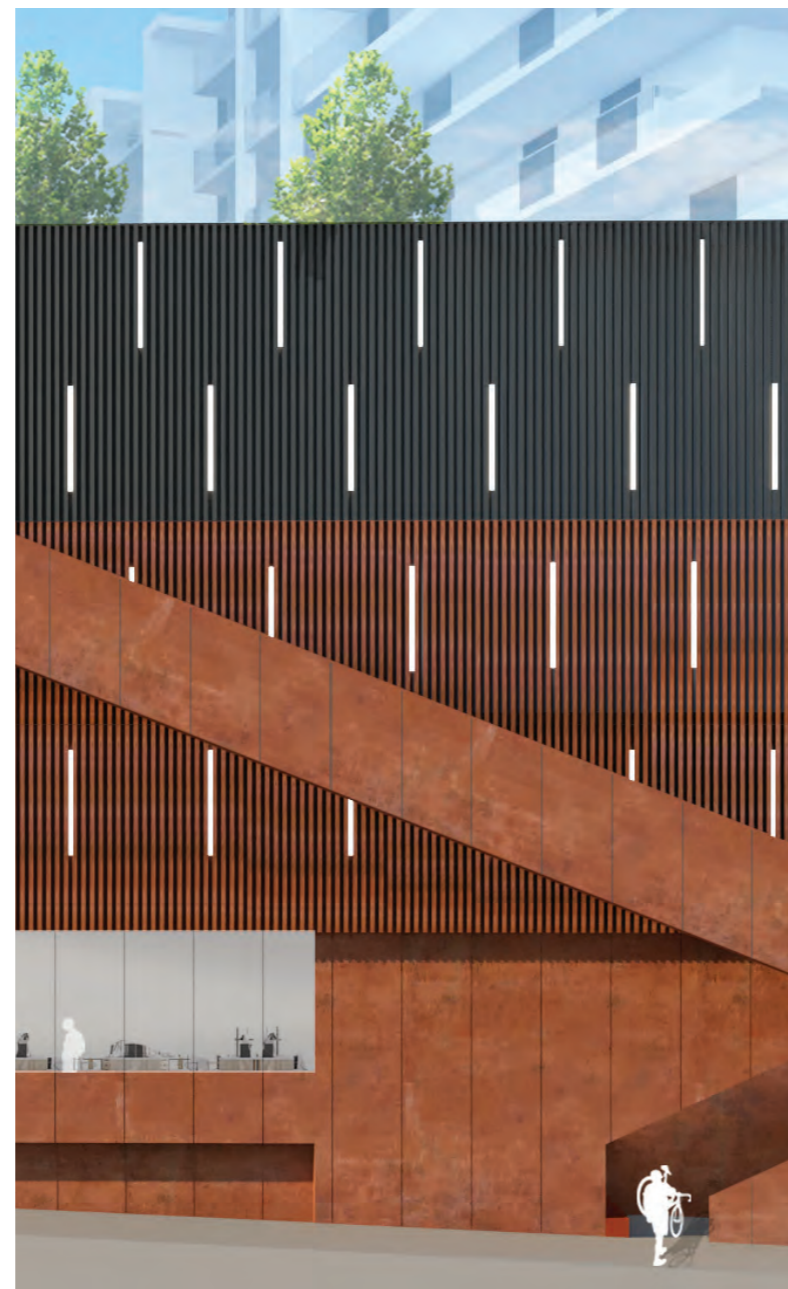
Facade study through escape stair and carpark screen.
